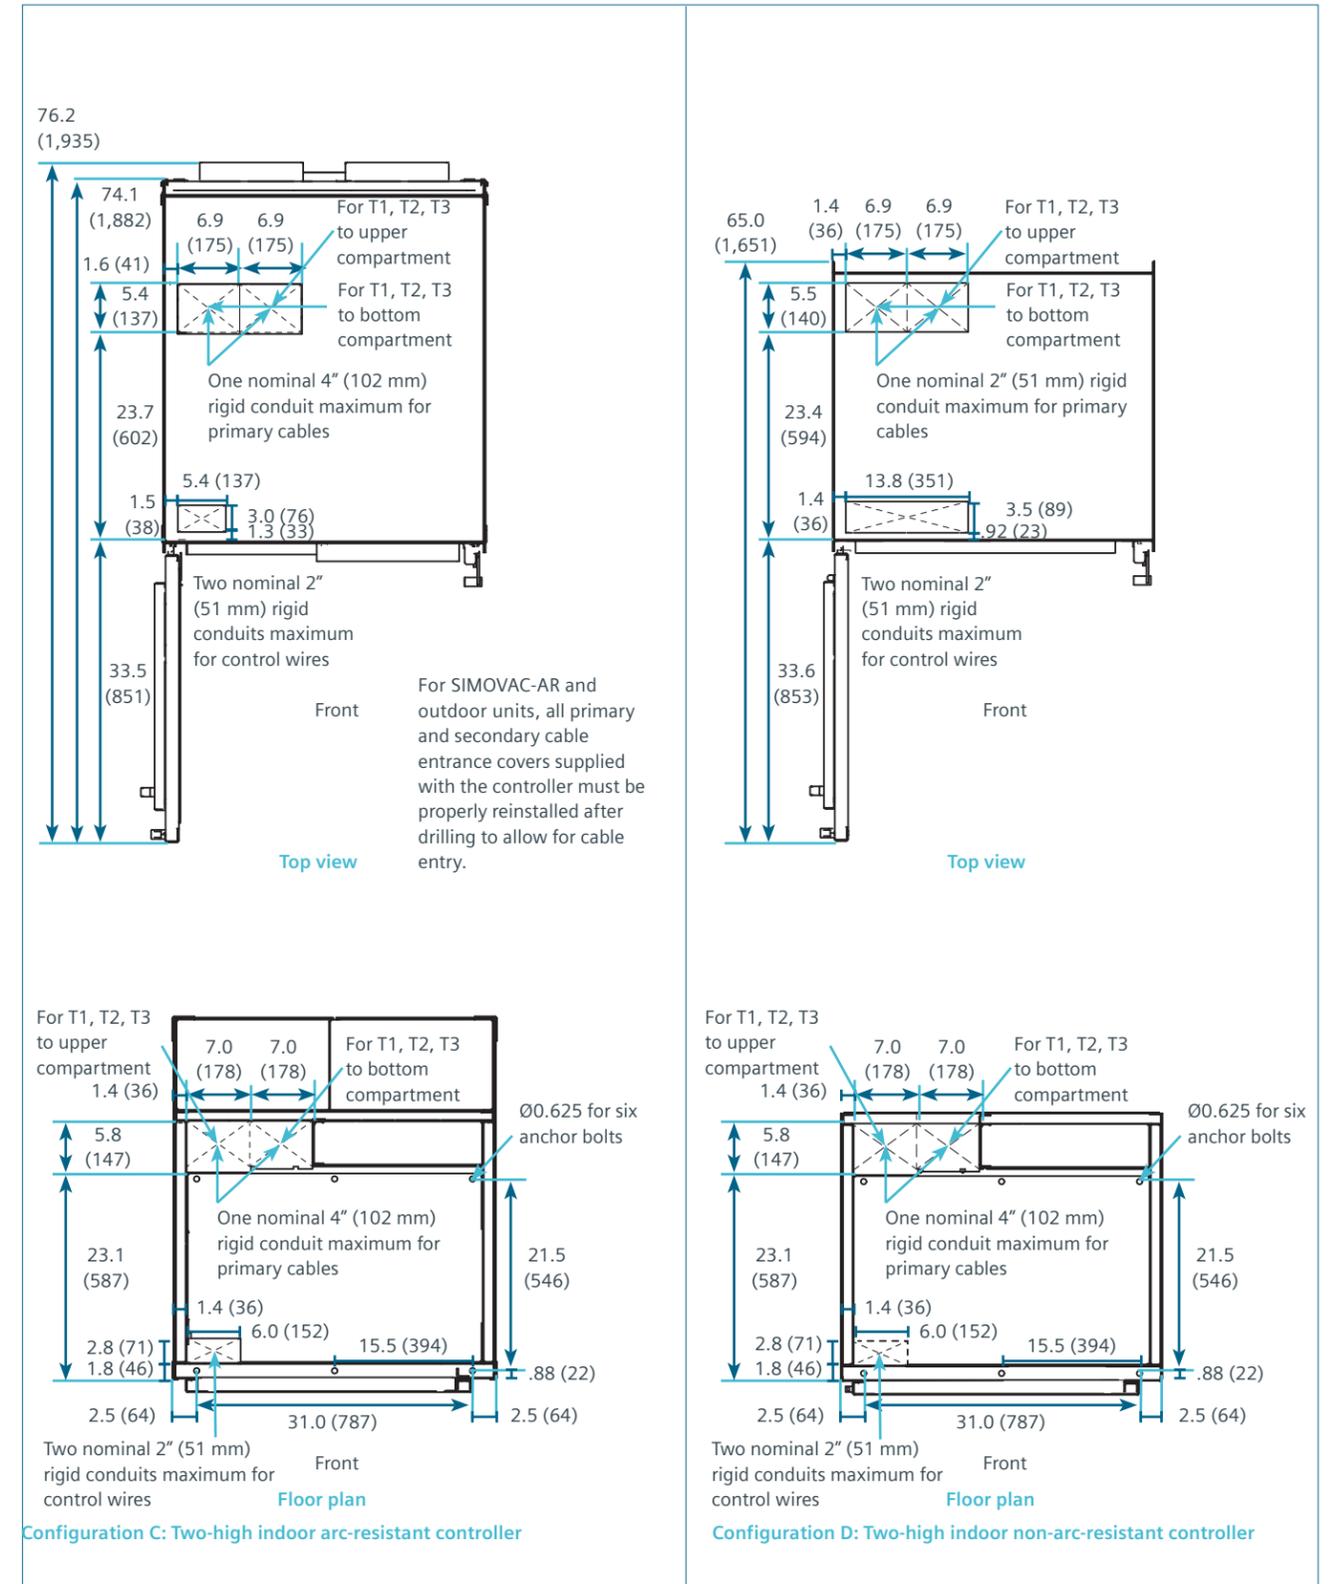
Top view and typical floor plans for SIMOVAC and SIMOVAC-AR controllers
